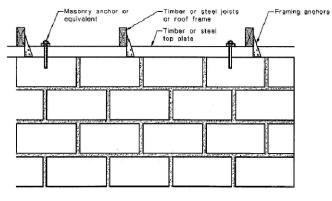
DETAILS OF TOP SUPPORT T5-TIMBER OR STEEL FRAMING
